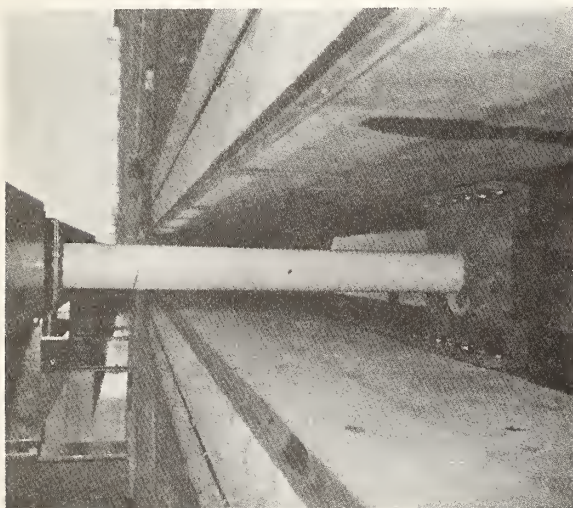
BRIDGE RAILING INSTALLATION FOR TEST NO. 1
